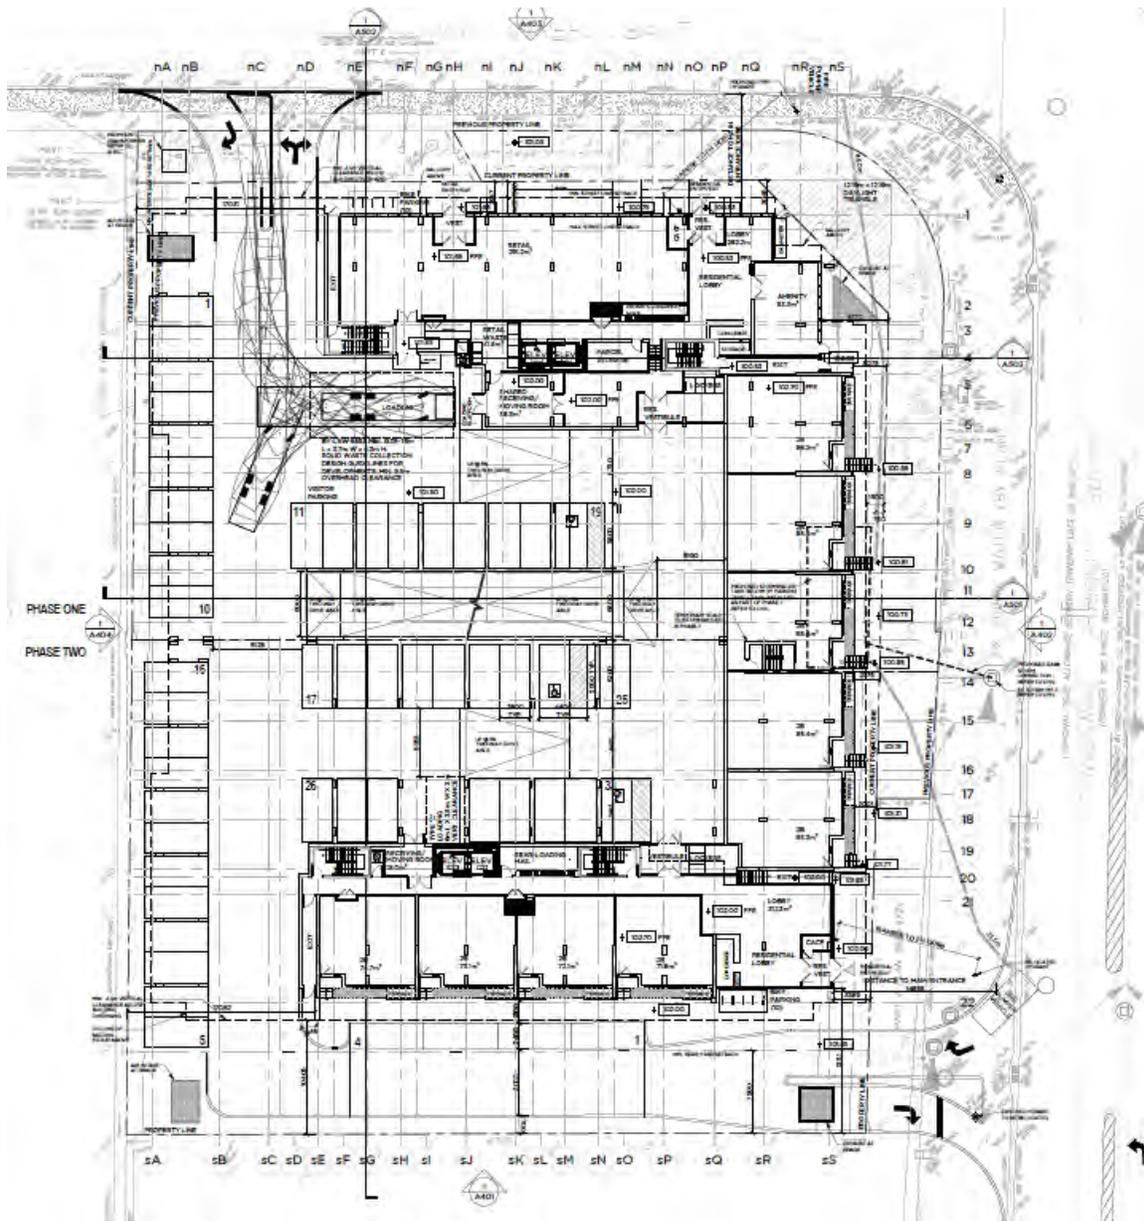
Proposed Site Plan, Proposed Ground Floor Plan of the new development at 2900 King St. E.
